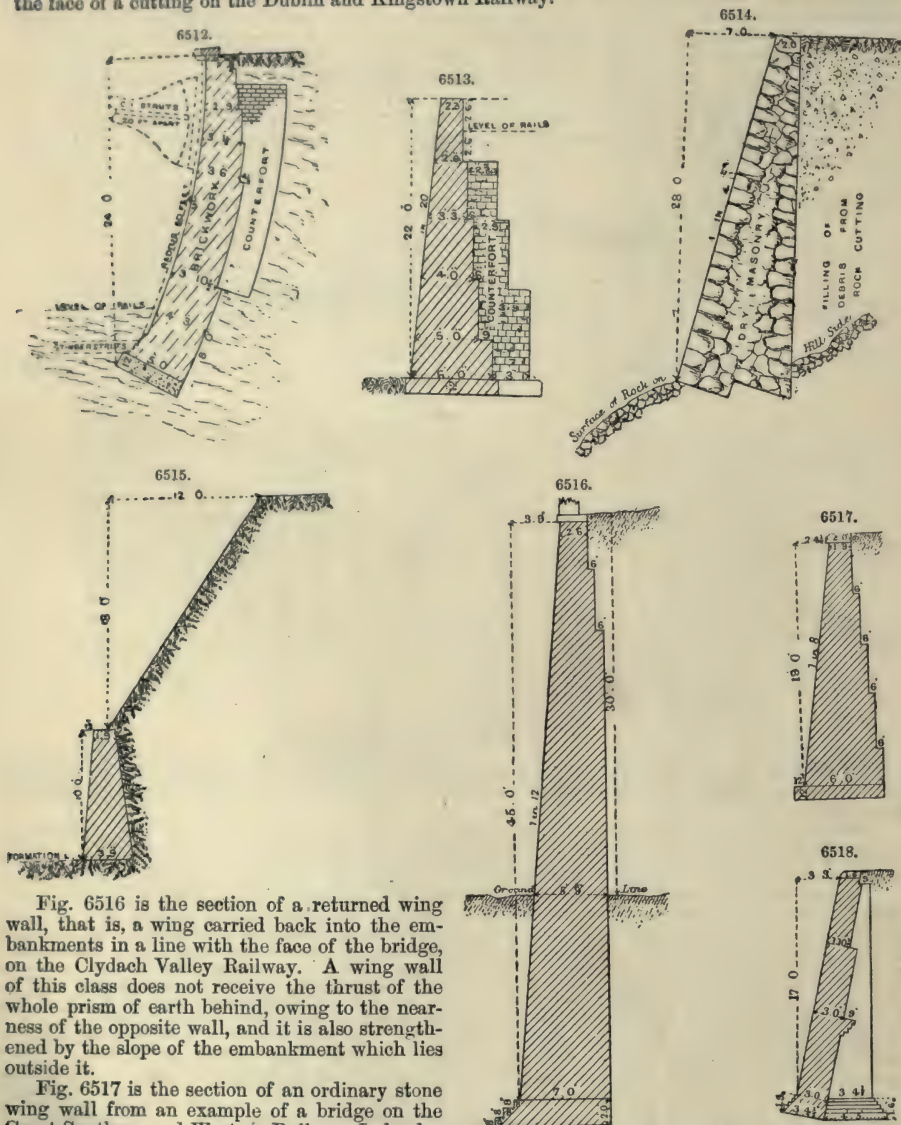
is the section of a returned wing wall, that is, a wing carried back into the embankments in a line with the face of the bridge, on the Clydach Valley Railway. A wing wall of this class does not receive the thrust of the whole prism of earth behind, owing to the nearness of the opposite wall, and it is also strengthened by the slope of the embankment which lies outside it.
